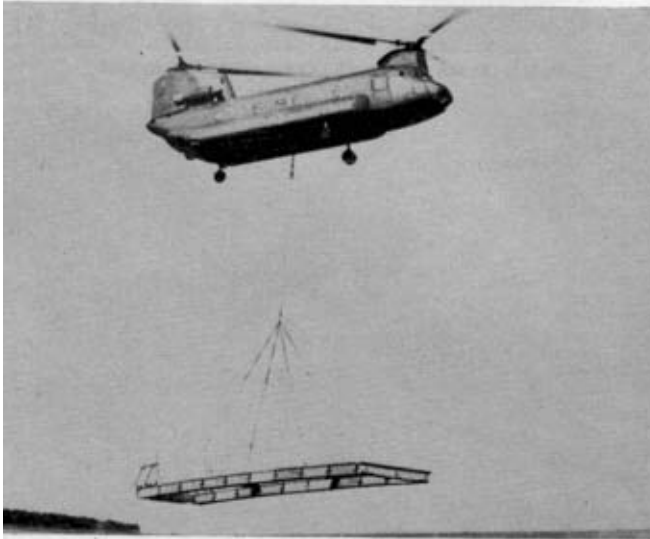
CH 47A Carrying 55 ft of Single Storey MGB (undecked).
